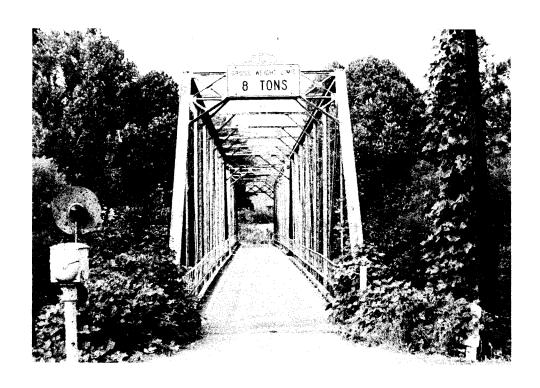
The Chicago Bridge Company built this two-span Pratt through truss in Russell County in 1891.
